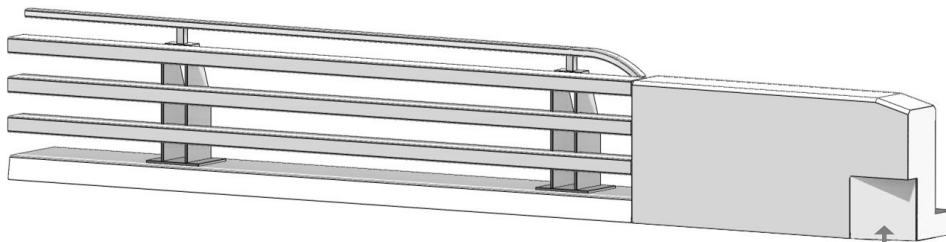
RTE 1 - Devil's Slide bridge Type 80 barrier with bike railing
